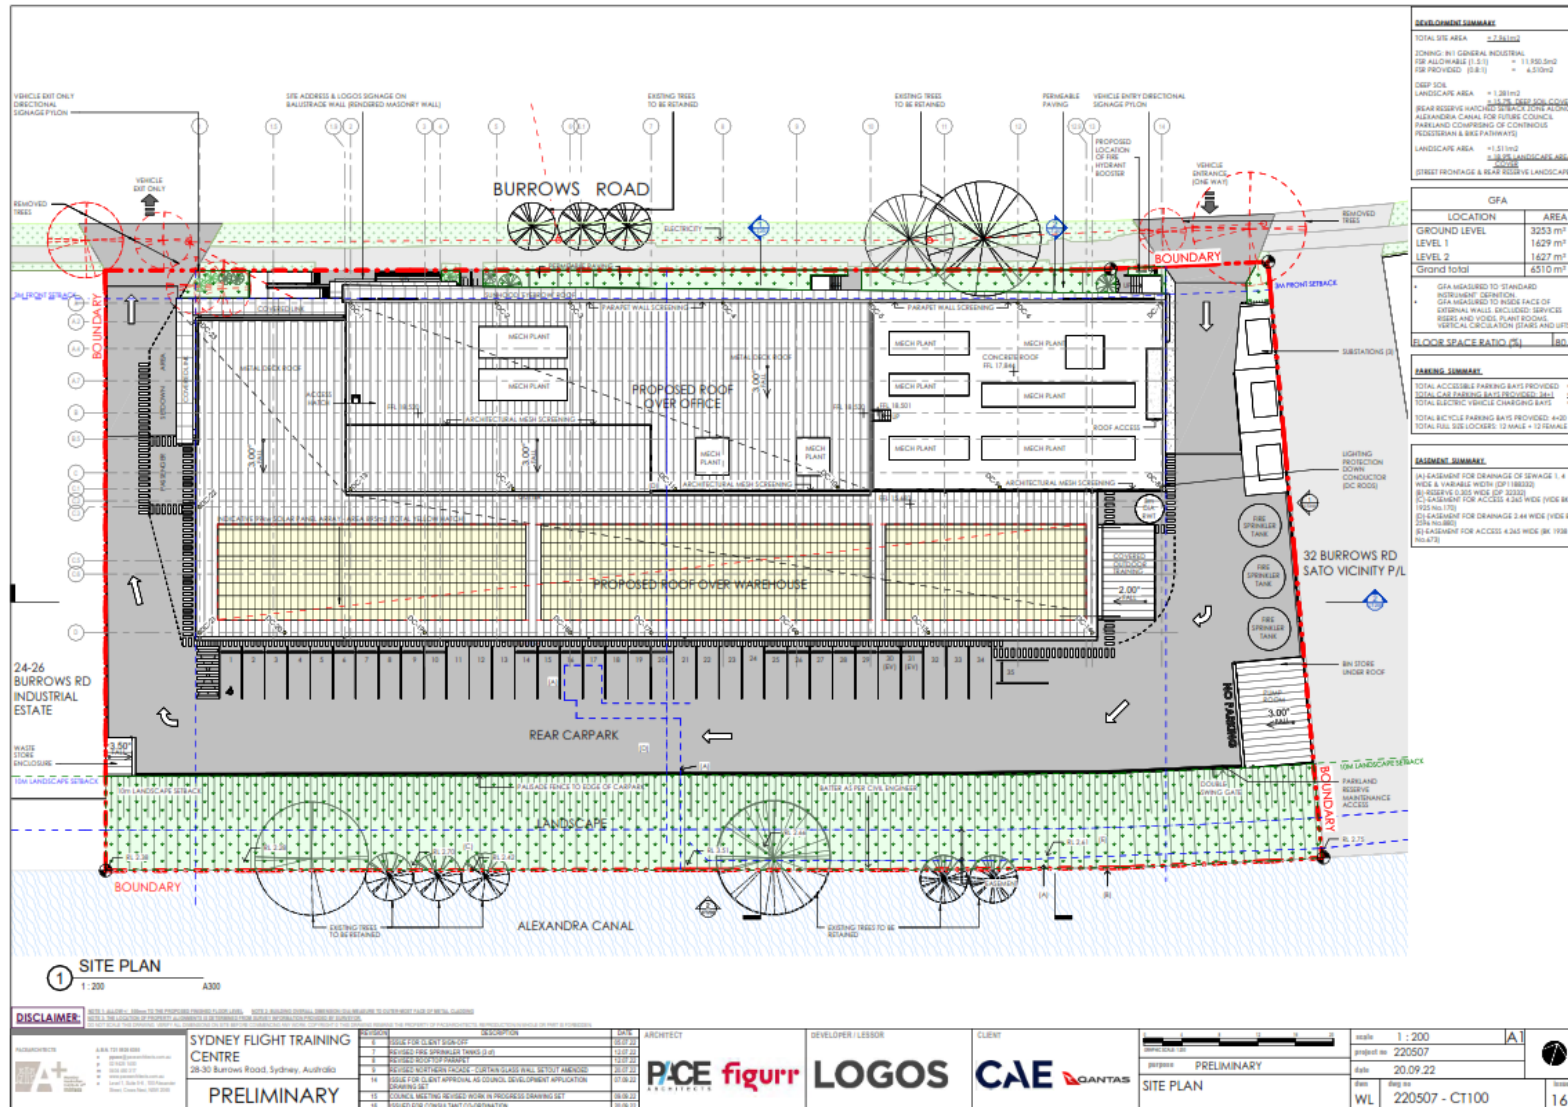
Site Plan of Sydney Flight Training Facility 28-30 Burrows Road. (Source: CAE and LOGOS, 2022)
